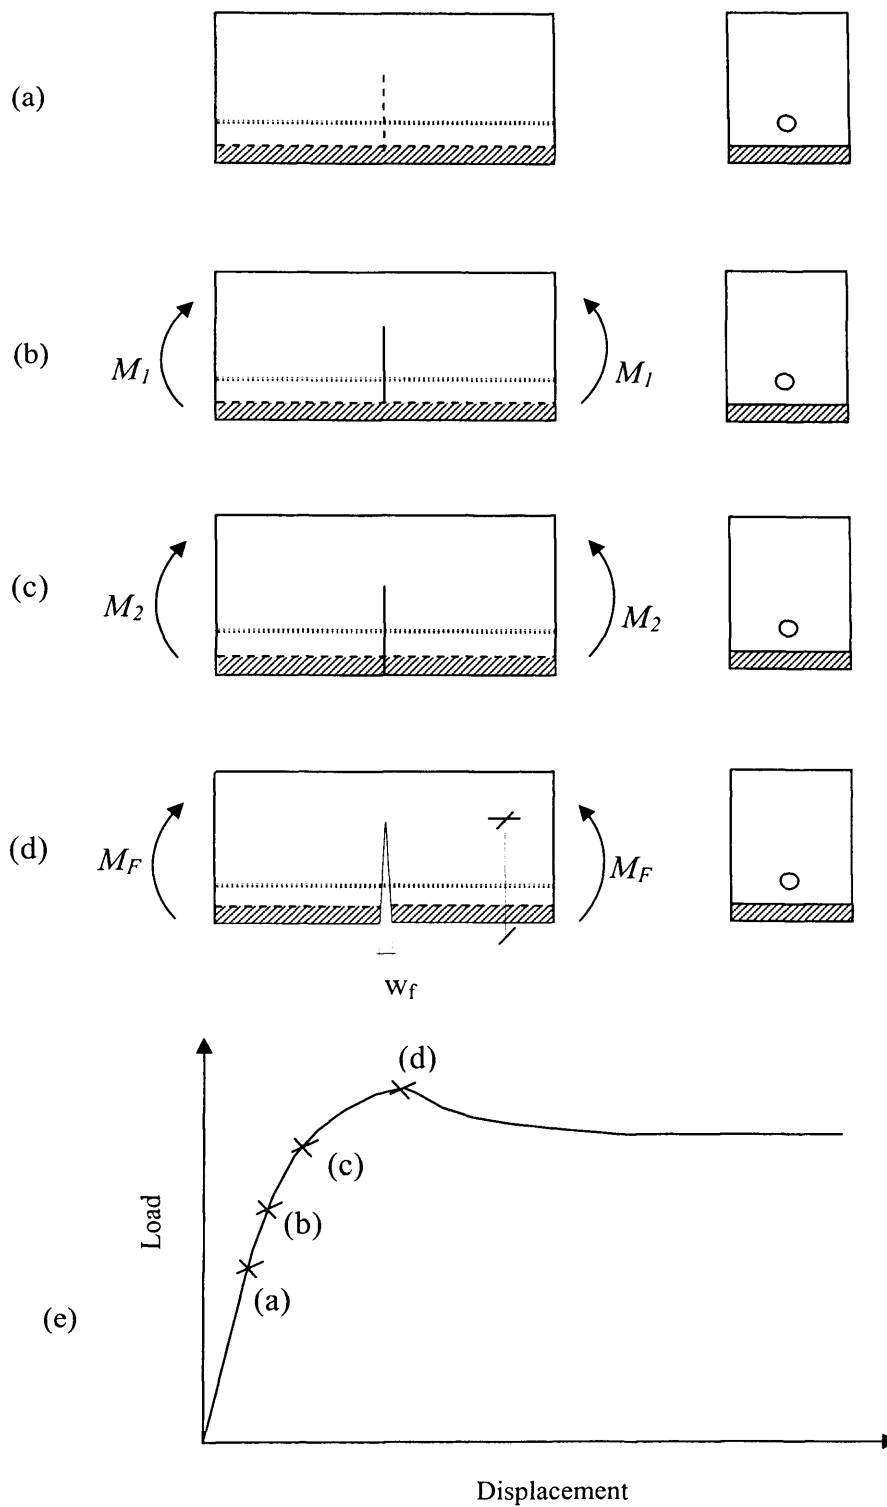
Sequence of crack growth in the middle part of the beams retrofitted with one strip: (a) existing crack in the pre-damaged beam, (b) reopening of the existing crack in the pre-damaged beam, (c) propagation and penetration of the dominant crack into the tension strip, (d) opening of the dominant crack, and (e) load levels corresponding to the observed crack growth sequence (After Alaei and Karihaloo, 2003b)
